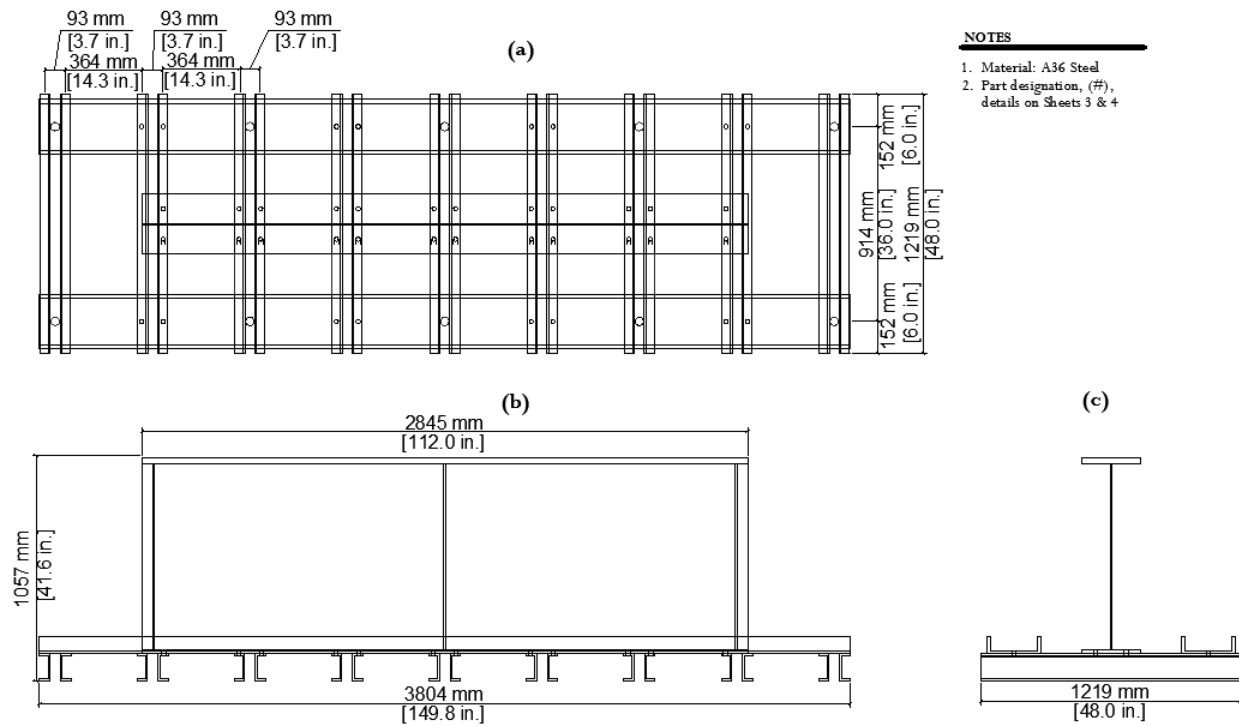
Girder Specimen: a) Plan view b) Elevation view c) Section view
